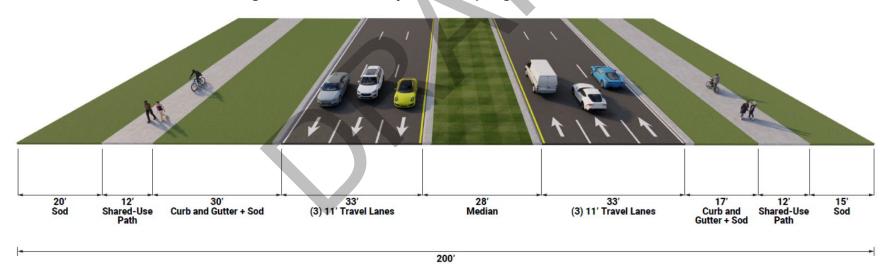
US 41 – Springs Plaza/Access Road to Southern "Crossover" Intersection
